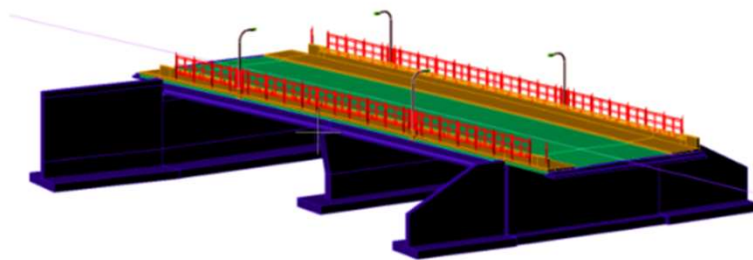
OpenBridge model of Milwaukee Avenue bridge
